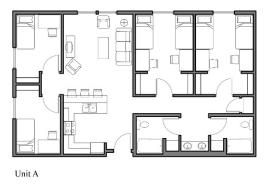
Gilbert Hall Unit Plans: Unit A, 6-person suite
